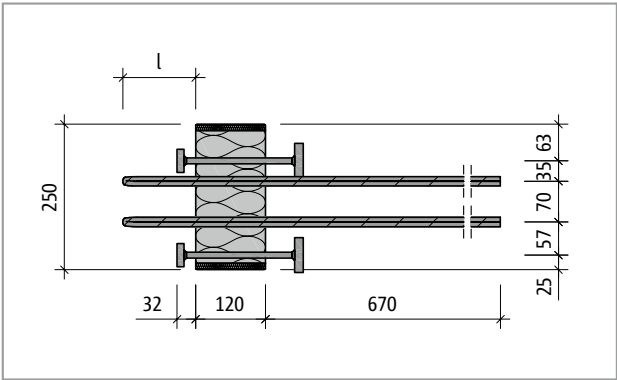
Schöck Isokorb® XT type O: Product plan view
